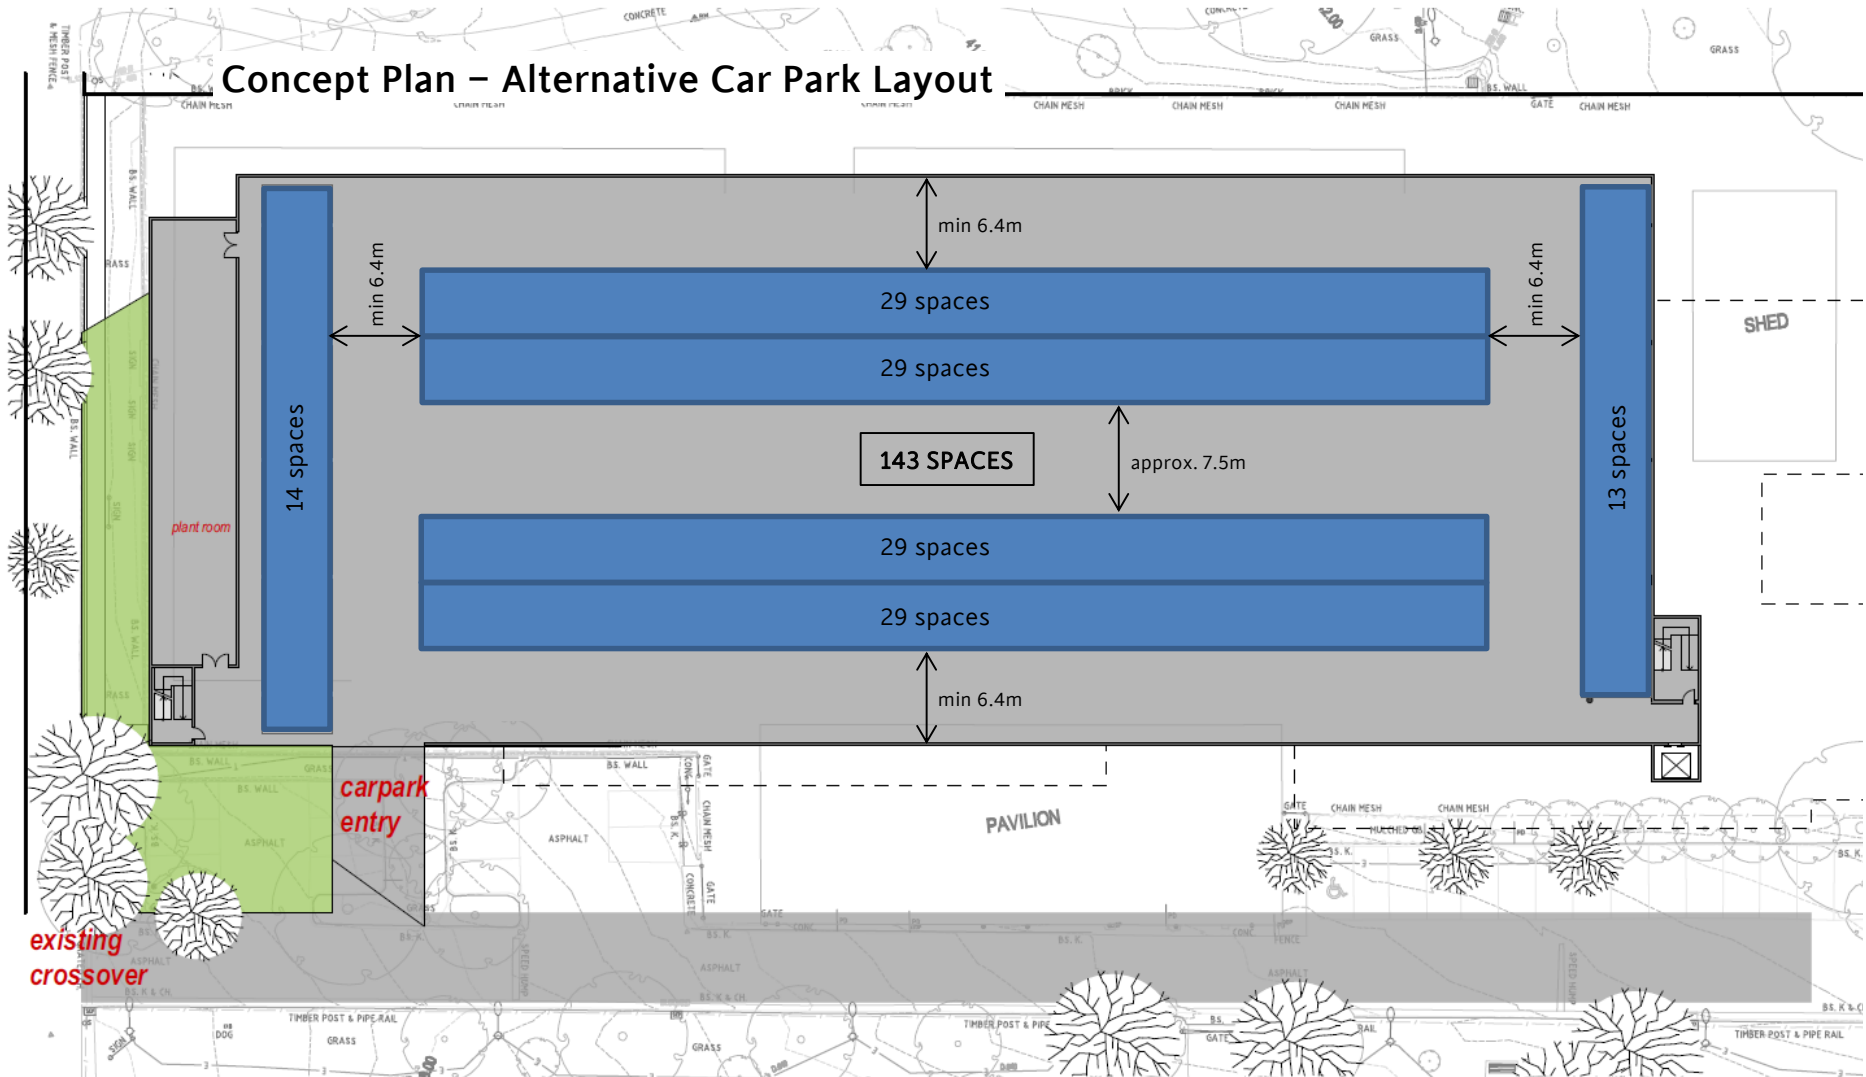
CONCEPT PLAN – ALTERNATIVE CAR PARK LAYOUT (143 SPACES)
